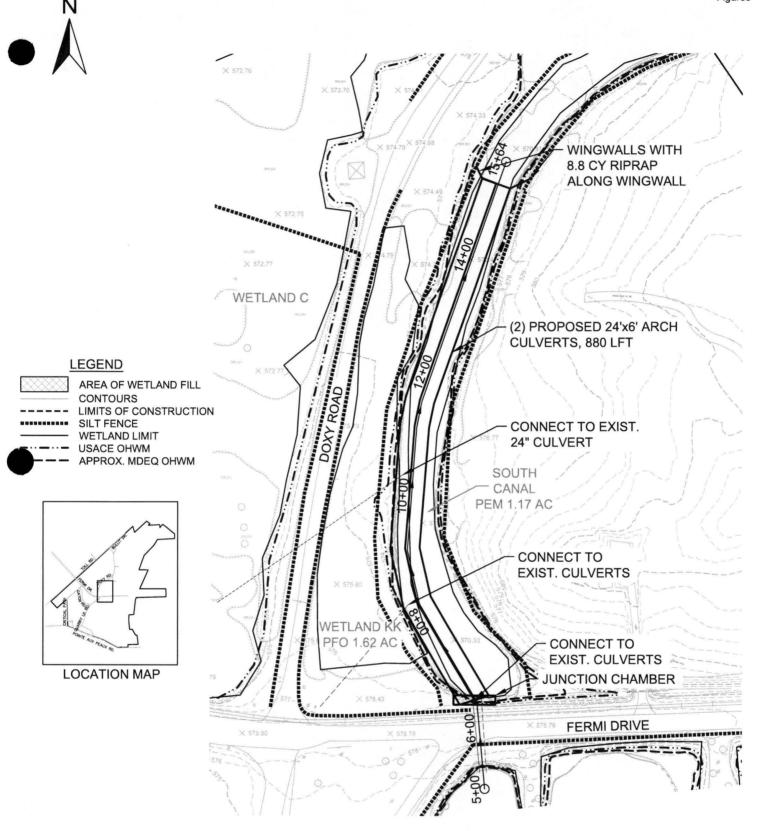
A CONSTRUCTION AREA 5 PLAN VIEW
